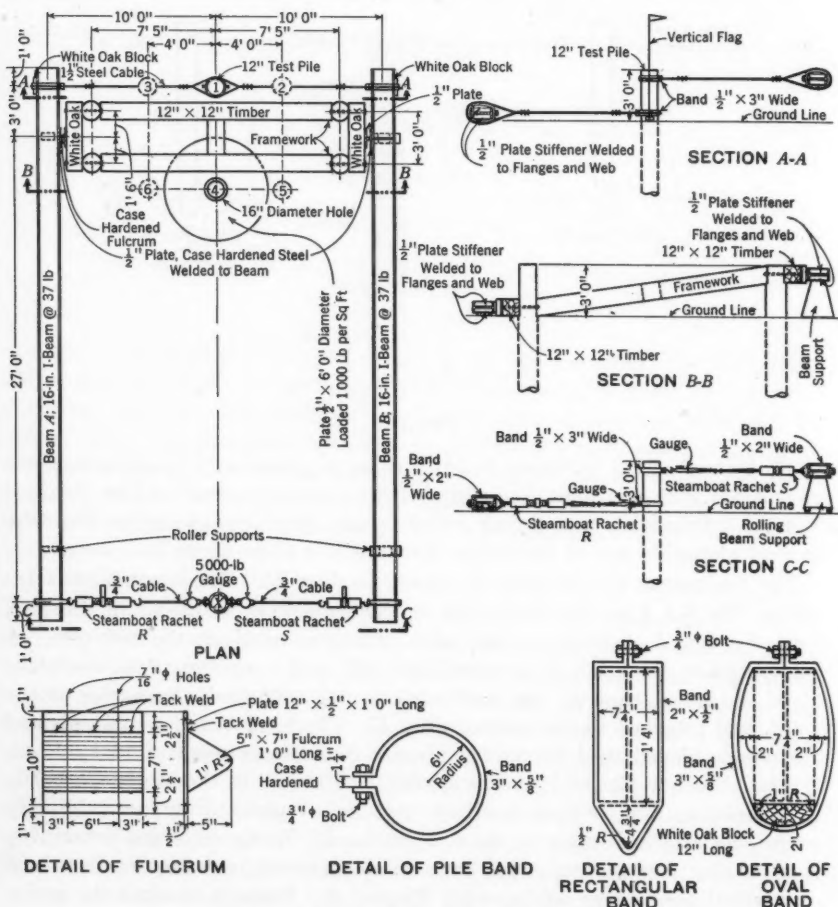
ARRANGEMENT FOR PILE TESTS.
